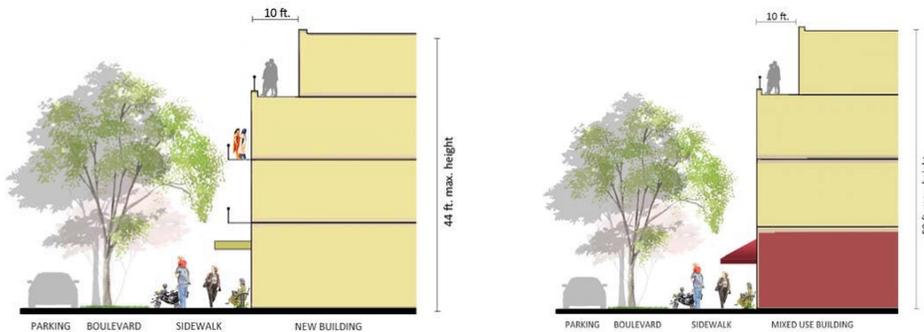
Images from page 47 of Linden Hills Small Area Plan
